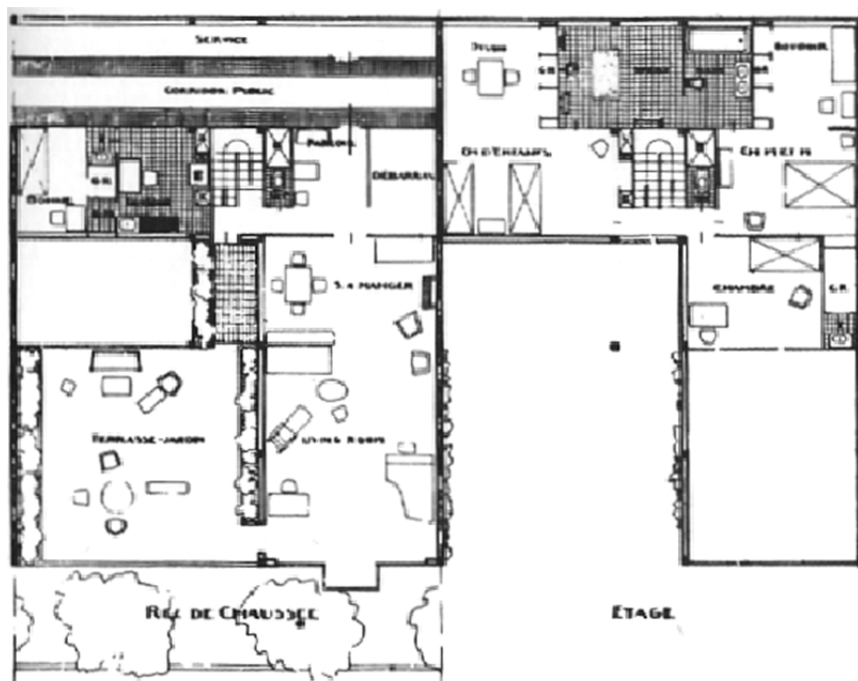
Le Corbusier, Immeuble Villas' floor plan.
